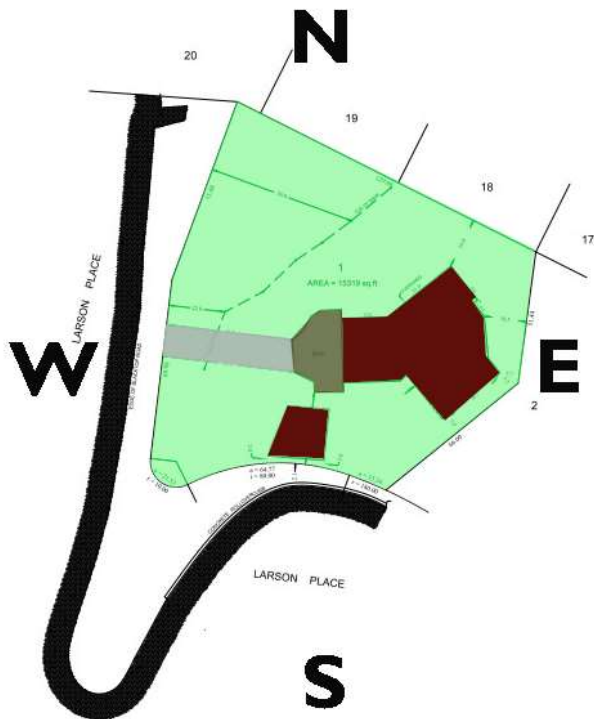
Survey & project orientation: LOT 1, Blk 9, DL 772, PL 17718
